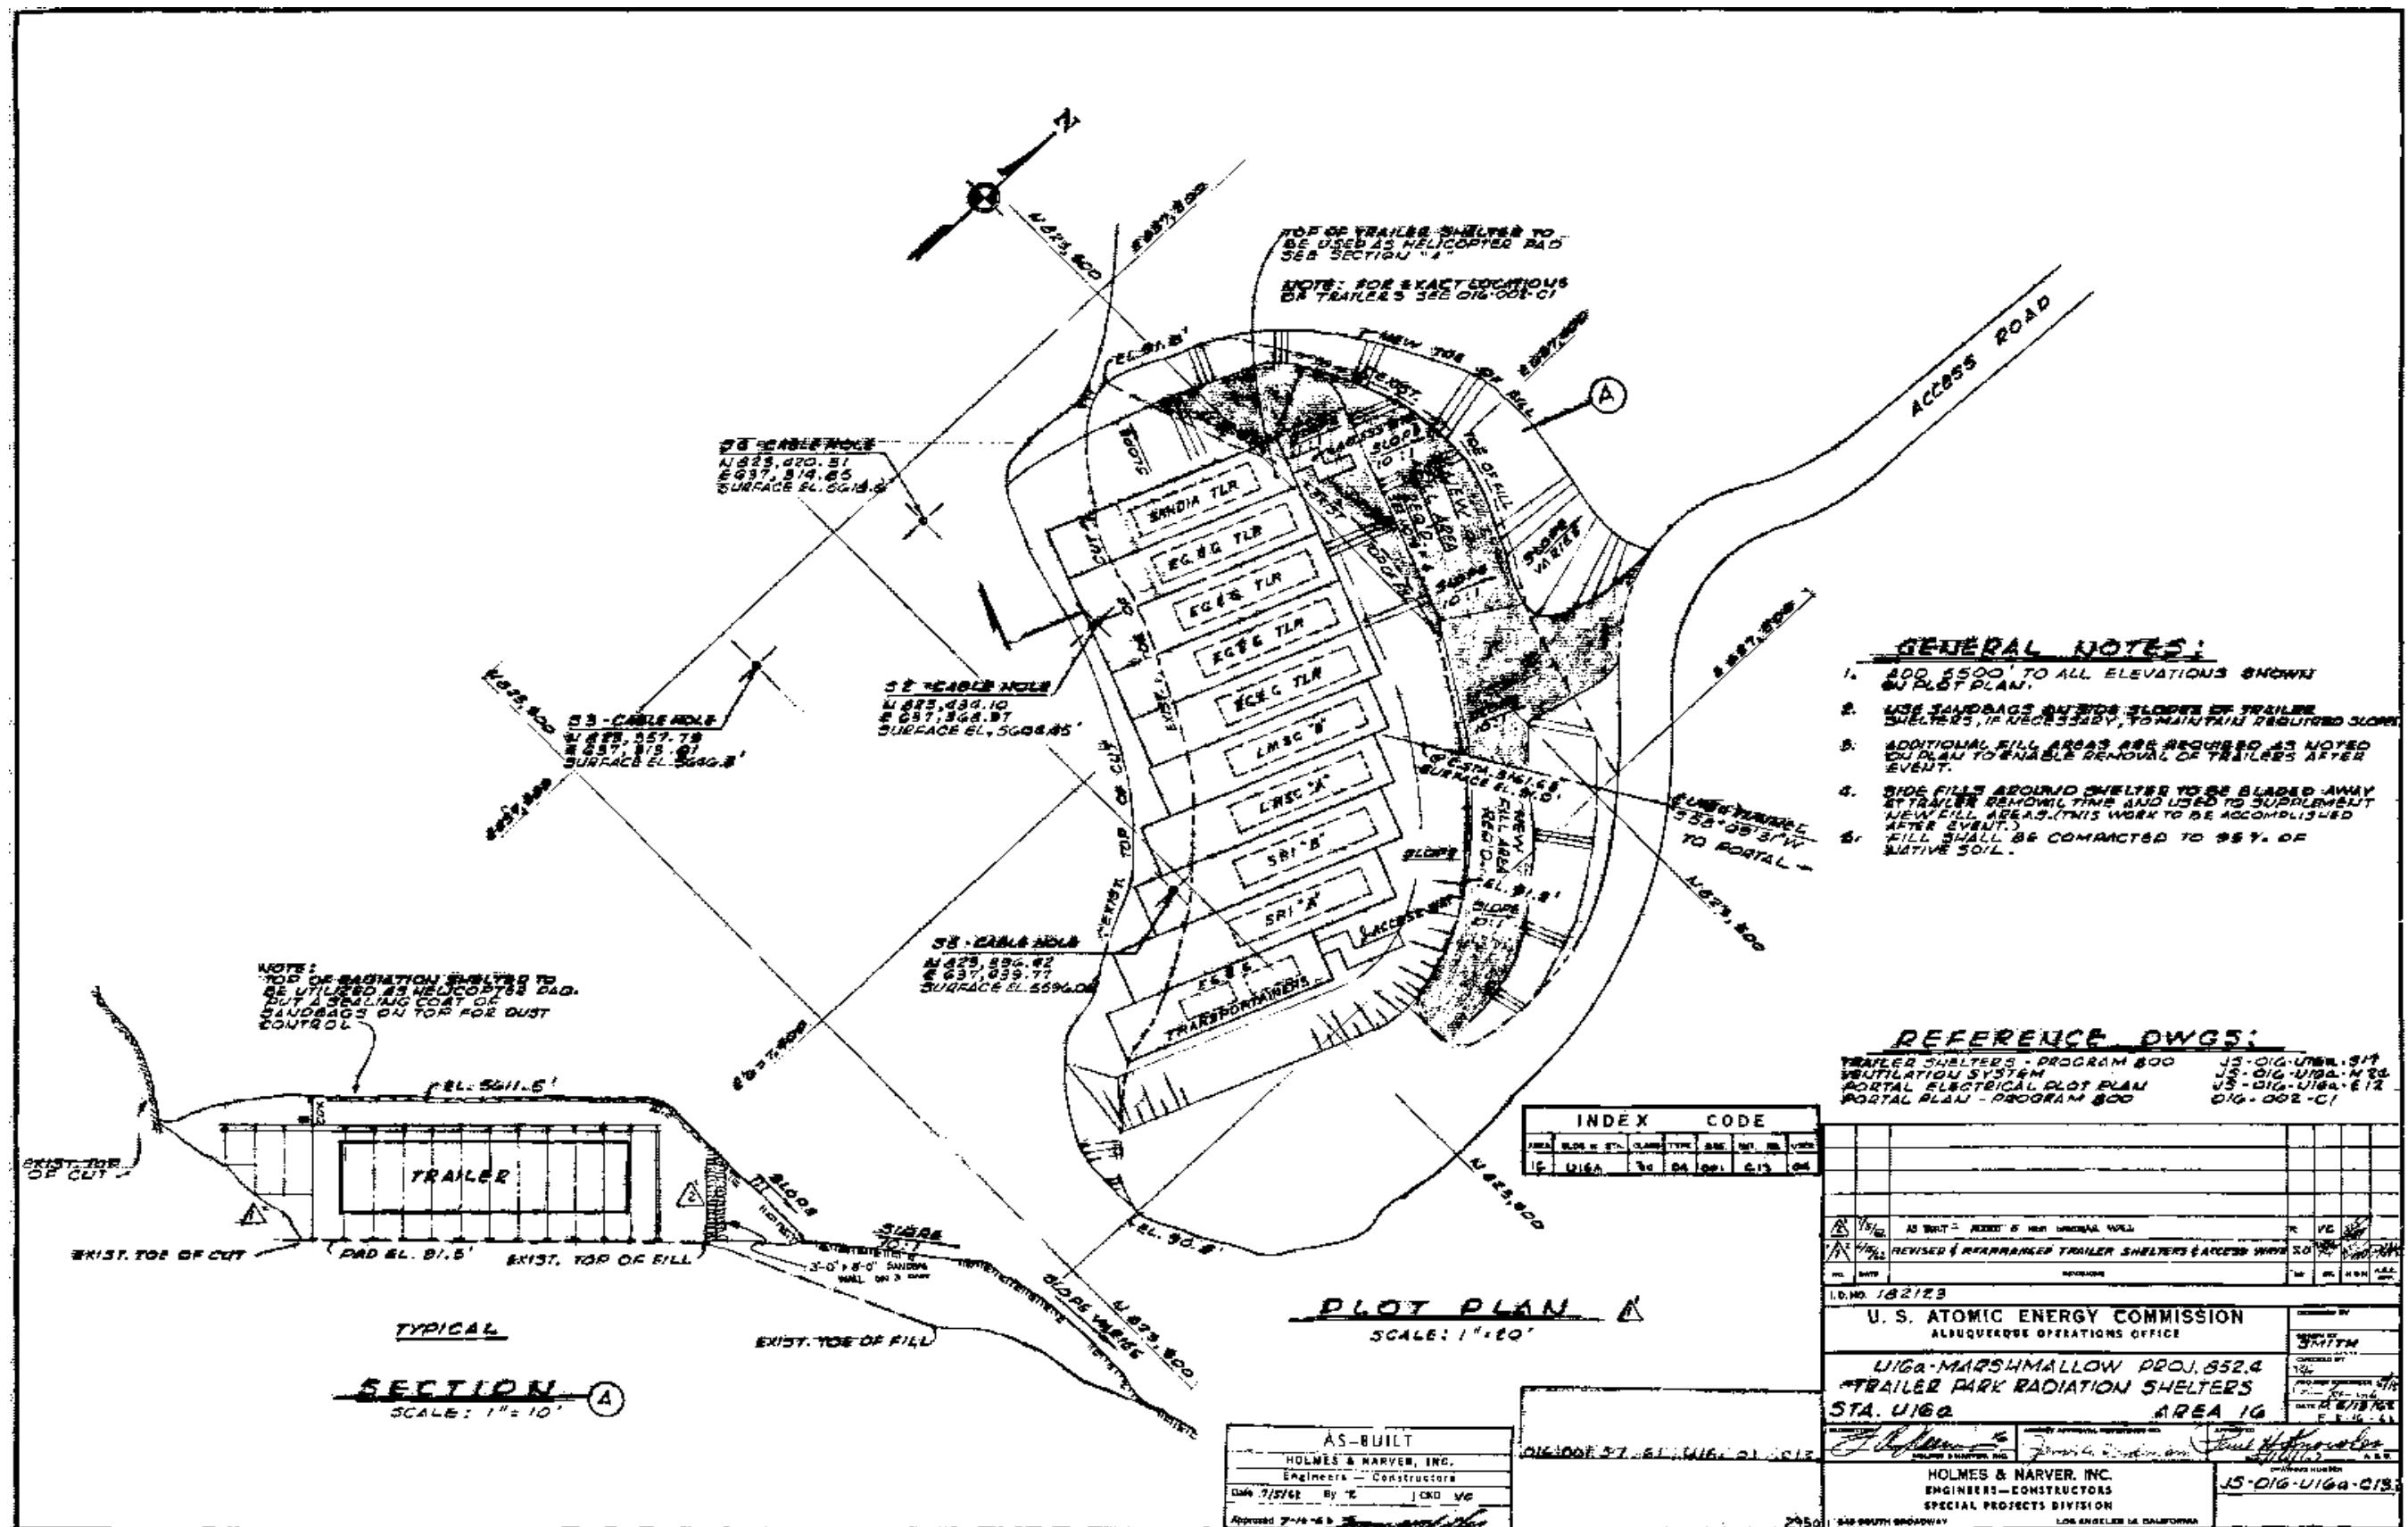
U16a Tunnel trailer park, Ft. Morgan, layout (1962 - on file at DOE Archives and Records Center).
